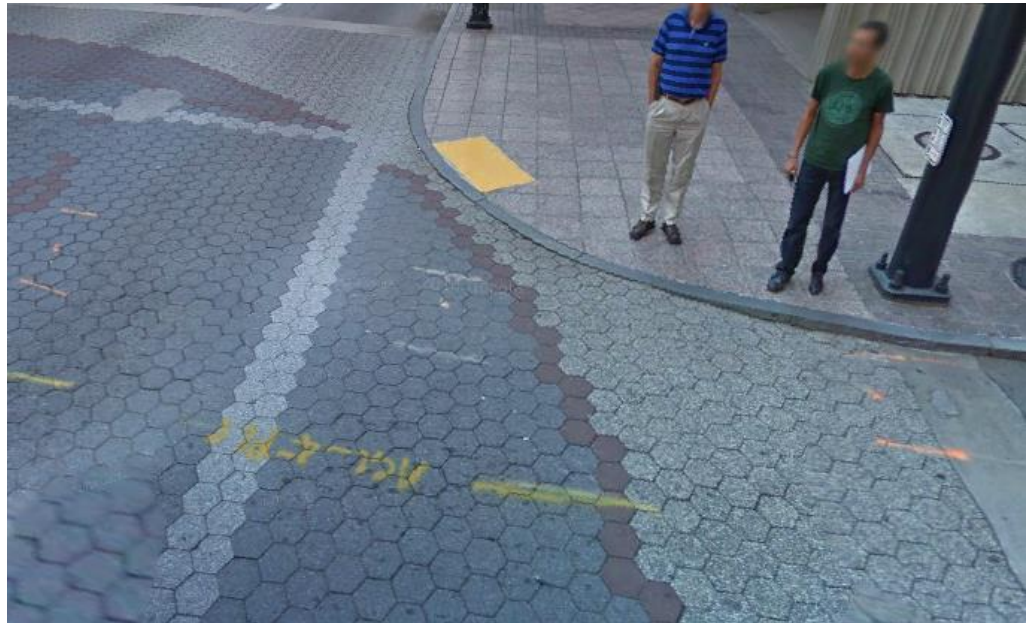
Poorly Delineated Crosswalks at Peachtree Street and Andrew Young International Boulevard
